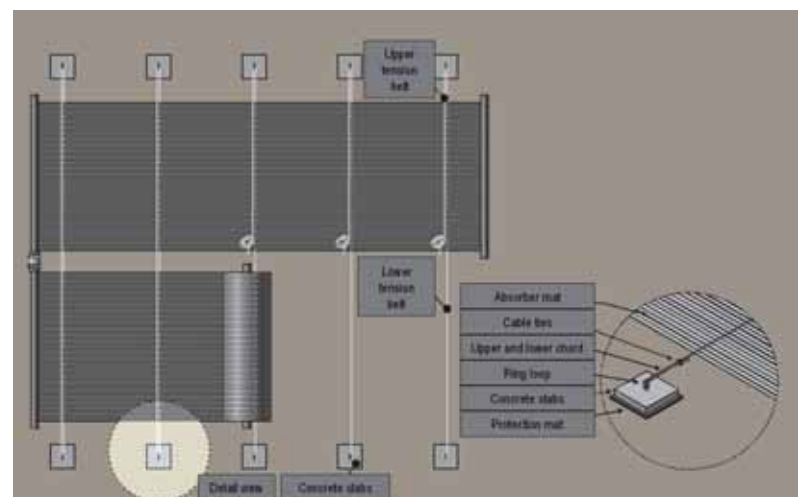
Fixing of absorbers with tension belts and concrete slabs on a flat surface
